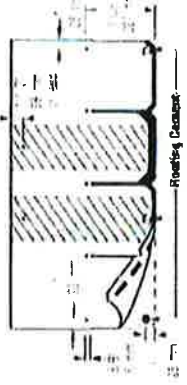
When installing Grand Manor Shangles on steep slopes use seven nails and three spots of asphalt roofing cement.
